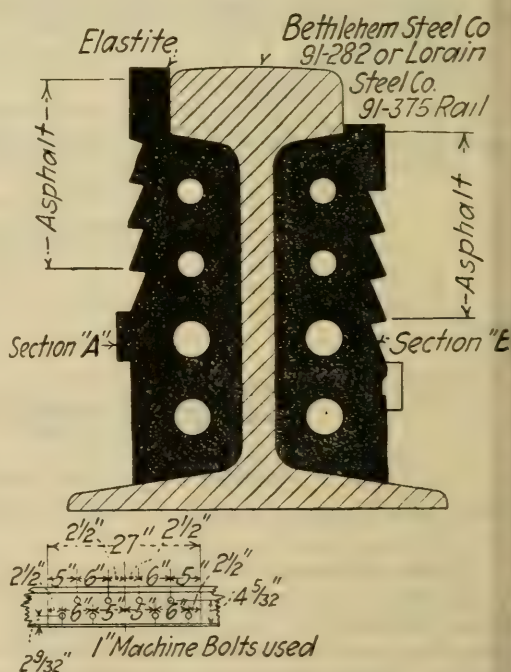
Street car track details, Rochester, N. Y. (1926).
